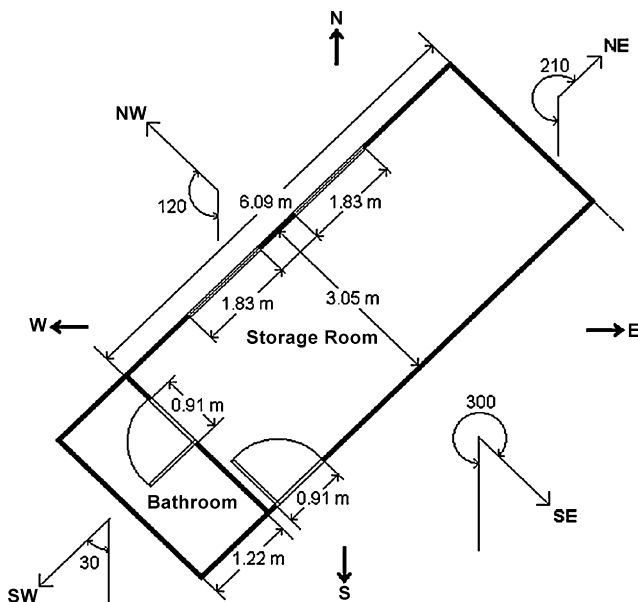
Schematic plan view of actual honey storage building at Gwalior [1].
